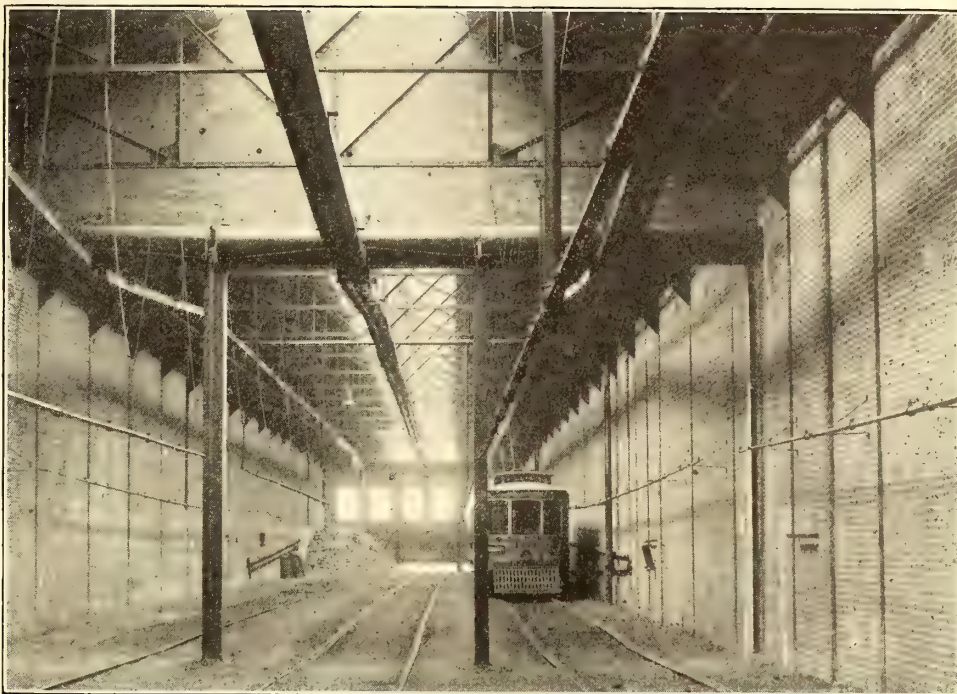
INTERIOR OF WINDERMERE CAR HOUSE, SHOWING ROLLER FIRE DOORS ROLLED UP
